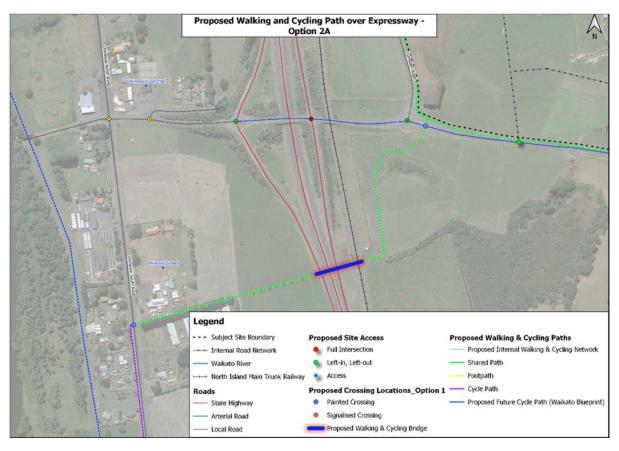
Proposed Walking and Cycling Connection over Expressway - Option 2A
